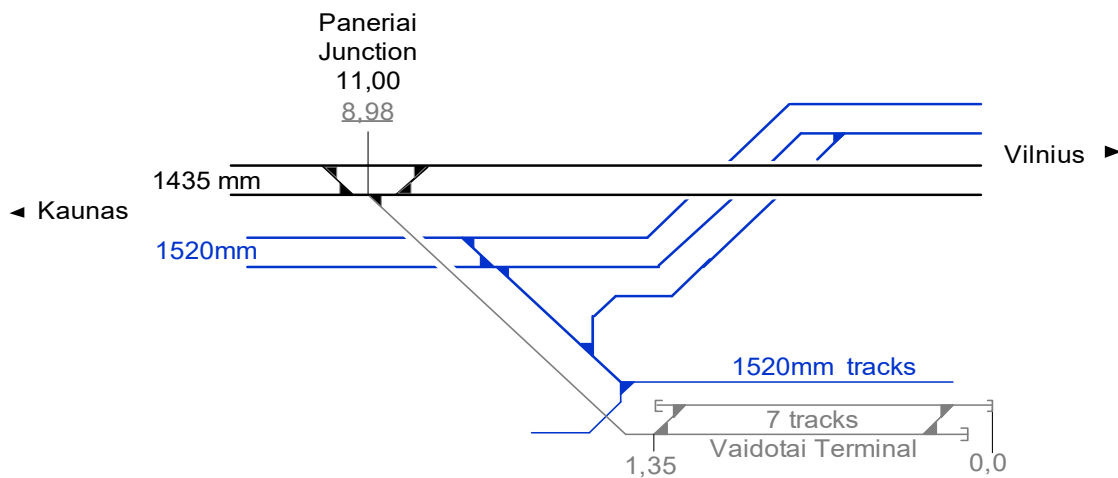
Currently proposed track layout for Paneriai junction and single track line to Vaidotai
